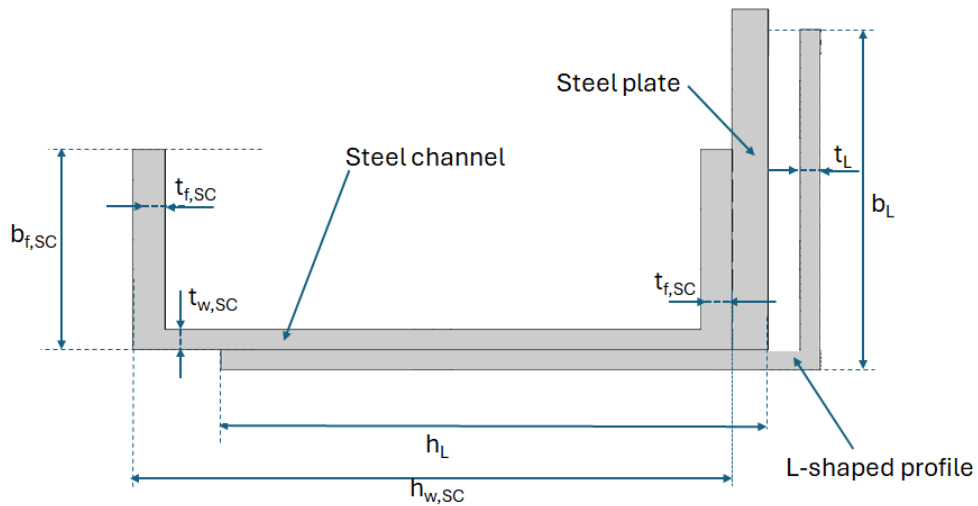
Definition of geometrical dimensions for the fusible link n°3
